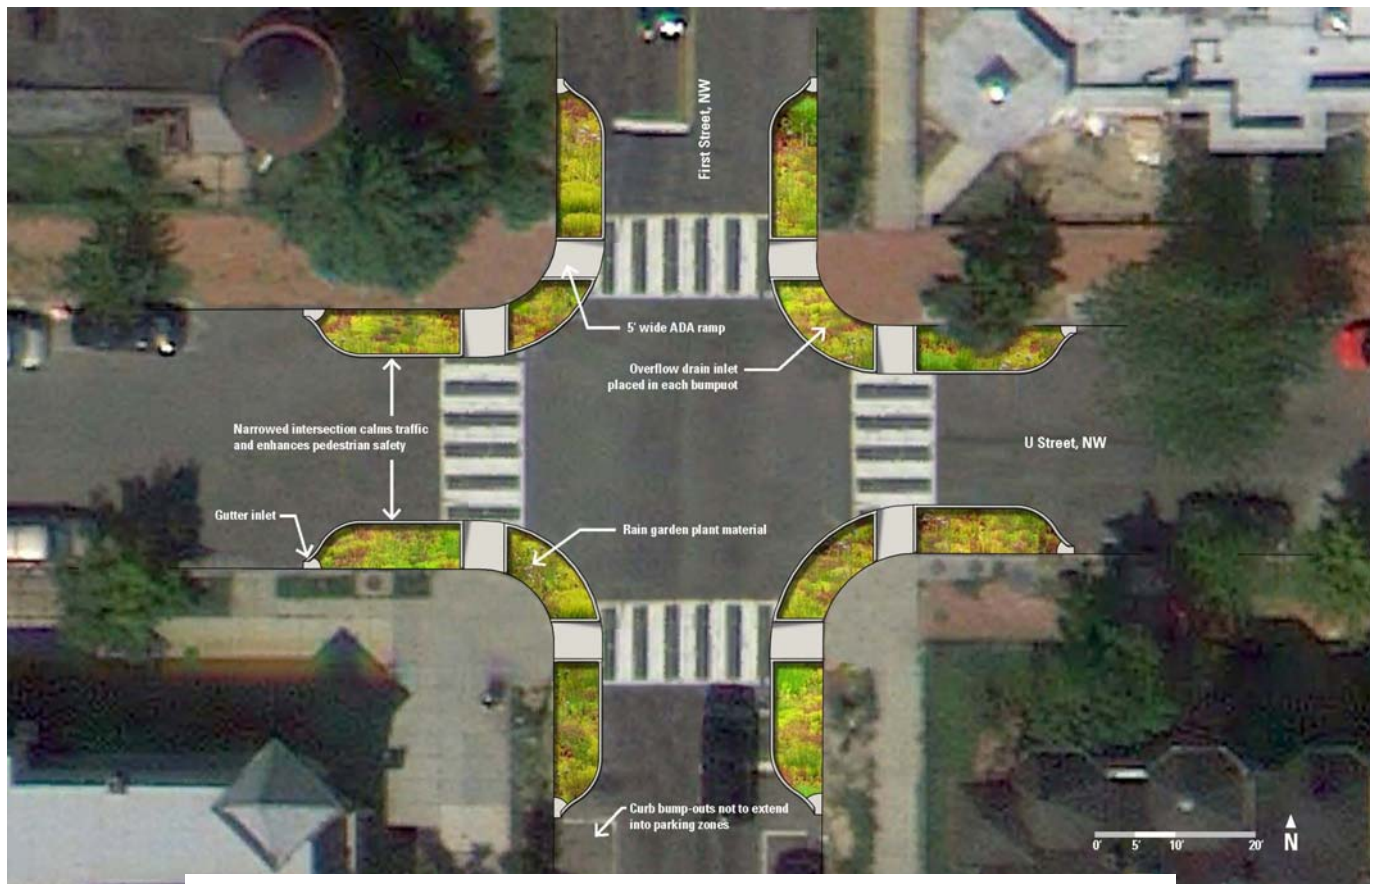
Proposed Curb Bump-out Rain Gardens at U Street and First Street
